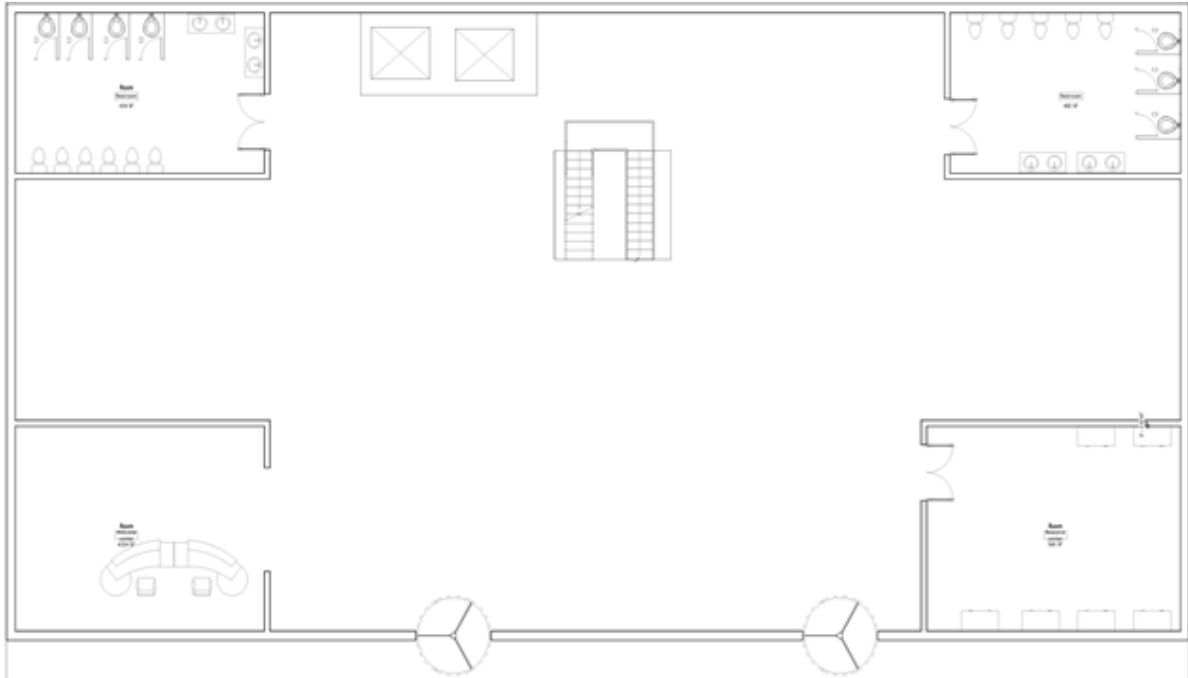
Basement floor plan of the Common Grounds Student Center.
